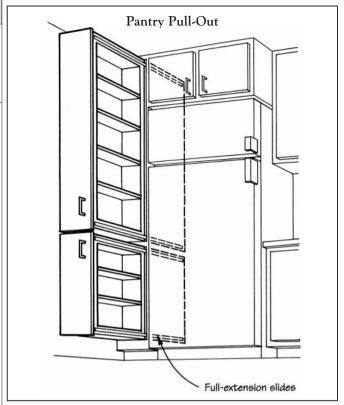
A pull-out pantry looks like a small bookcase turned sideways, mounted on heavy-duty, full-extension drawer slides, and slid end-first into a narrow cabinet. The pantry pulls out like a drawer, and gives shelf access from one side.
